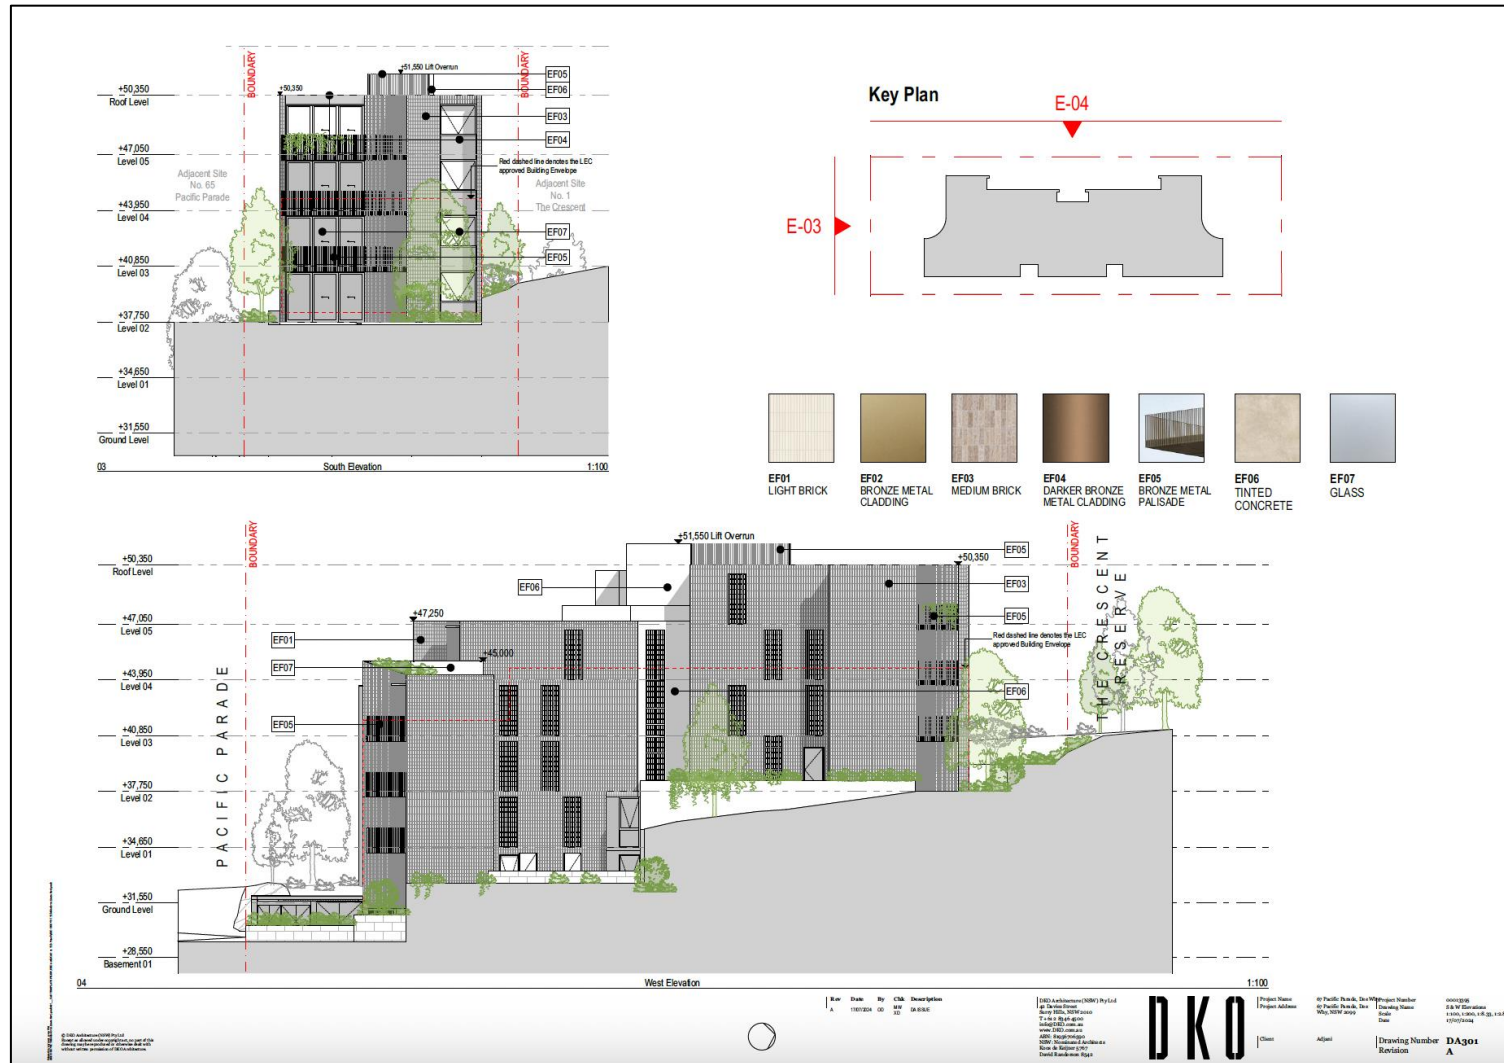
ILLUSTRATES PROPOSED SOUTH & WEST ELEVATIONS
